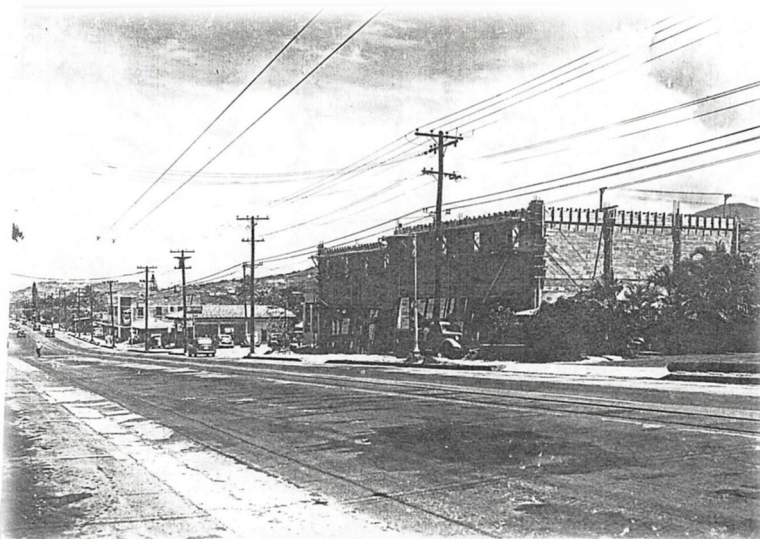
1946 Lee and Lee Building under construction. In 1940s many wood buildings were replaced by concrete versions.
